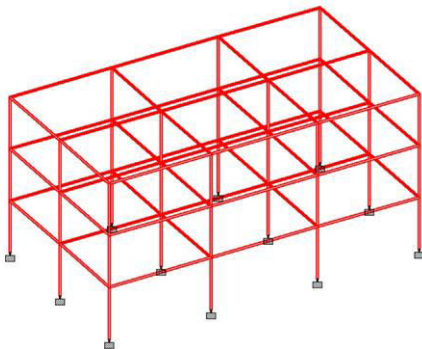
Three-dimensional rendered view of the building from STAAD Pro V8i
